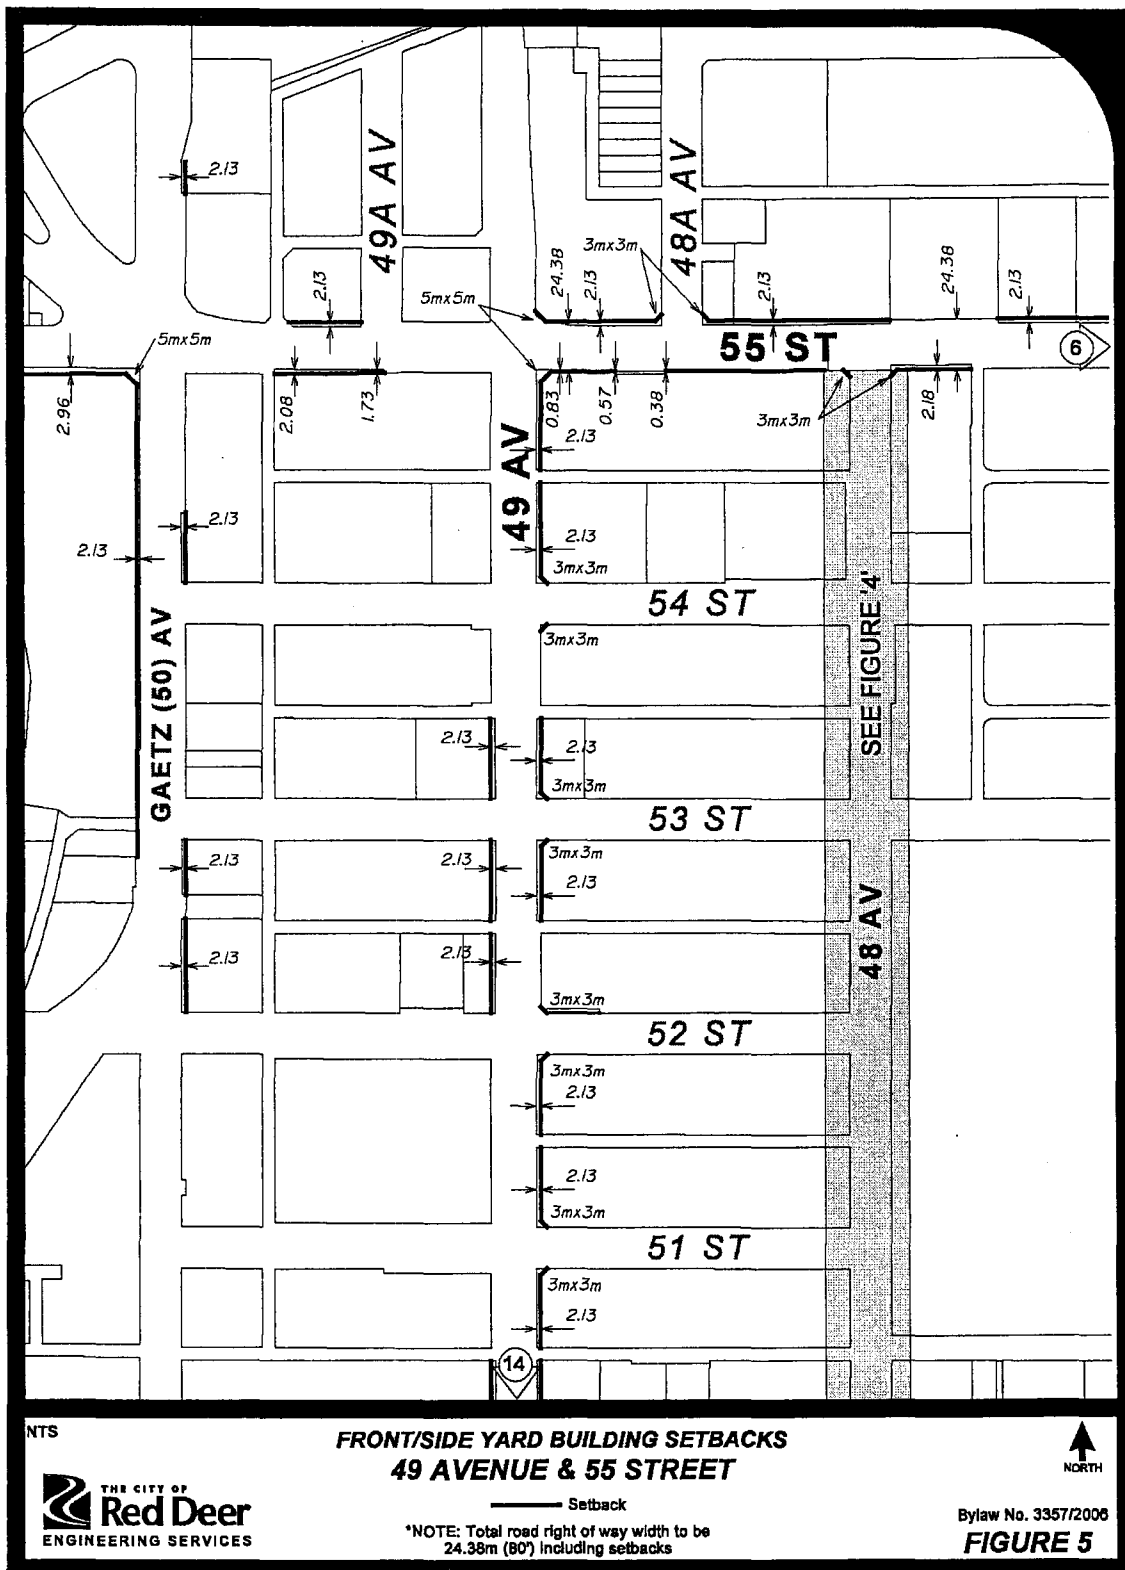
Front/Side Yard Building Setbacks 49th Avenue & 55 Street
